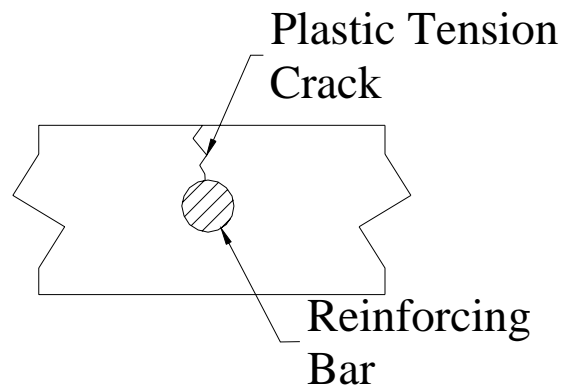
Plastic Tension Crack in Fresh Concrete
